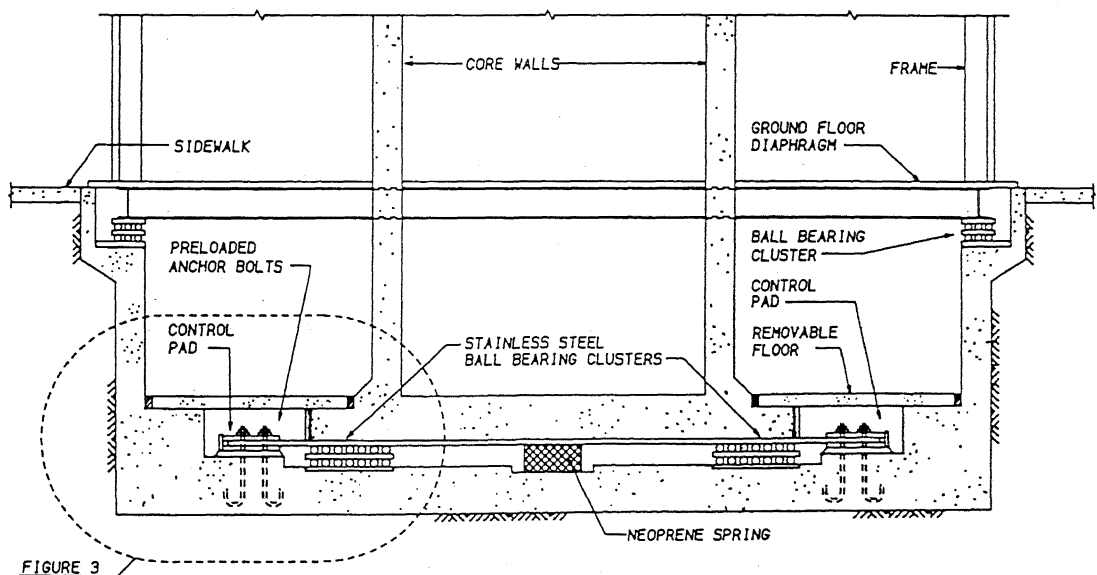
SECTIONAL ELEVATION THROUGH CORE WALL SHOWING CONTROL PADS AND BALL BEARING CLUSTERS
